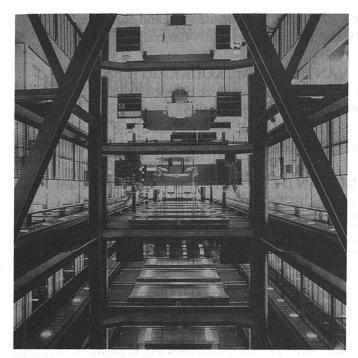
AOB, View, inside the building atrium, on slim floors and visible steel structure
